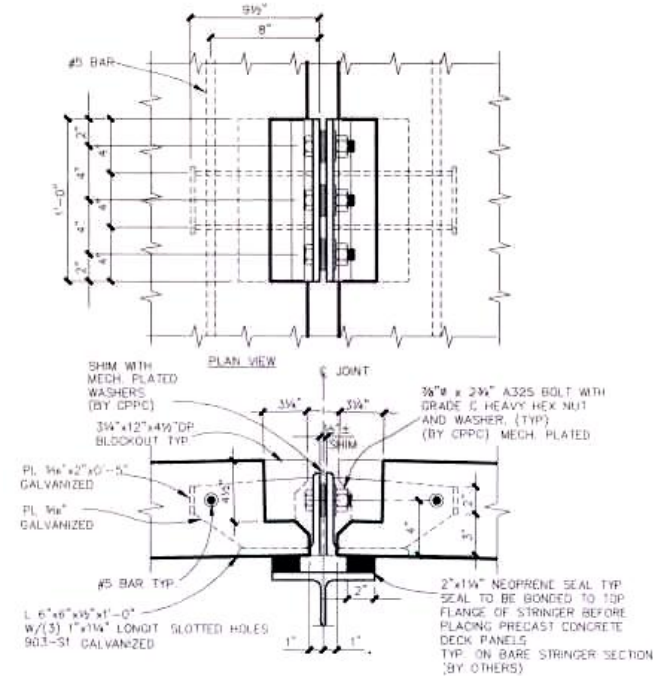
Longitudinal connection between the south and the north panels
